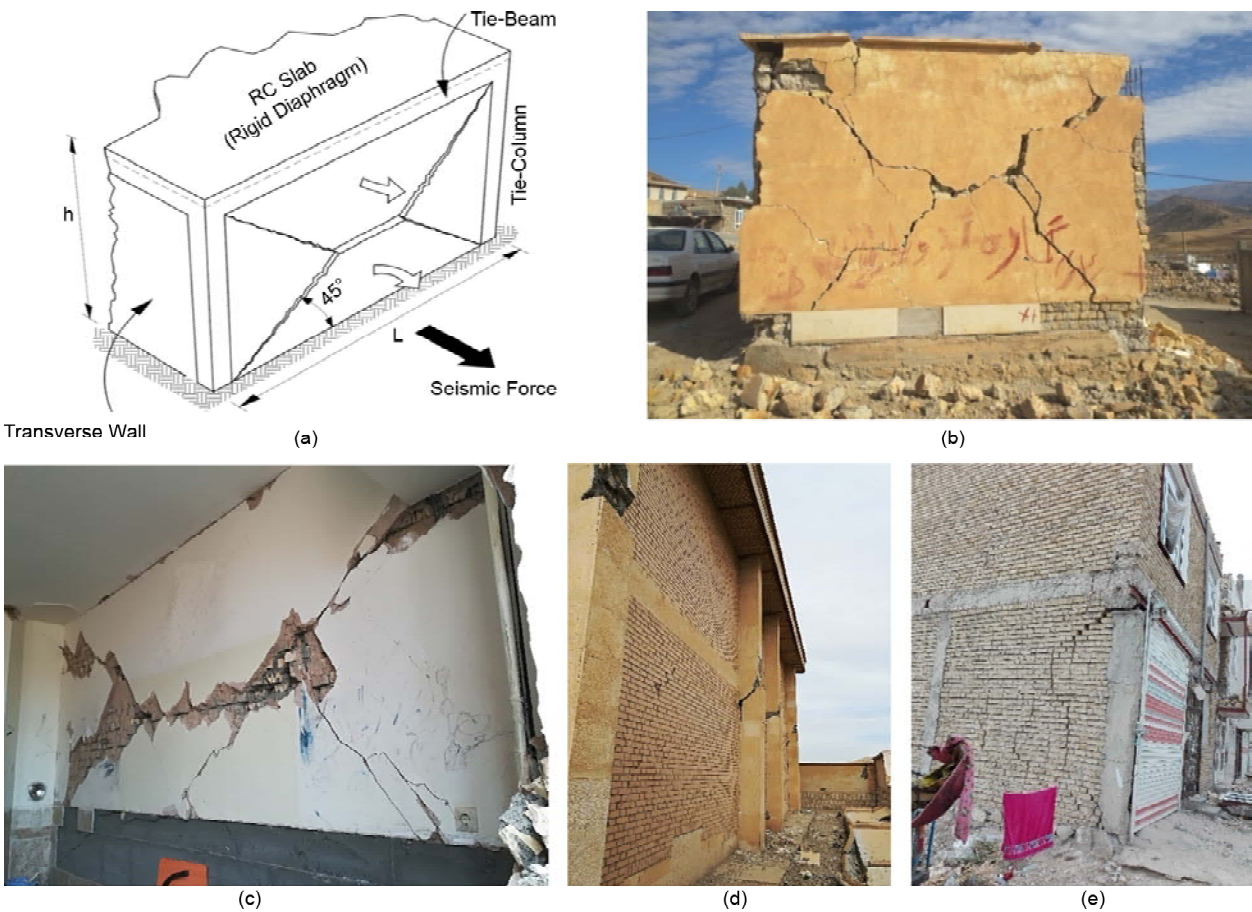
(a) Typical crack pattern of OP failure of CM walls due to the inertia force [8], (b, c) Instances of OP damage of CM walls due to the inertia force, (d, e) Instances of OP damage of CM walls due to the large inter-story drifts.
